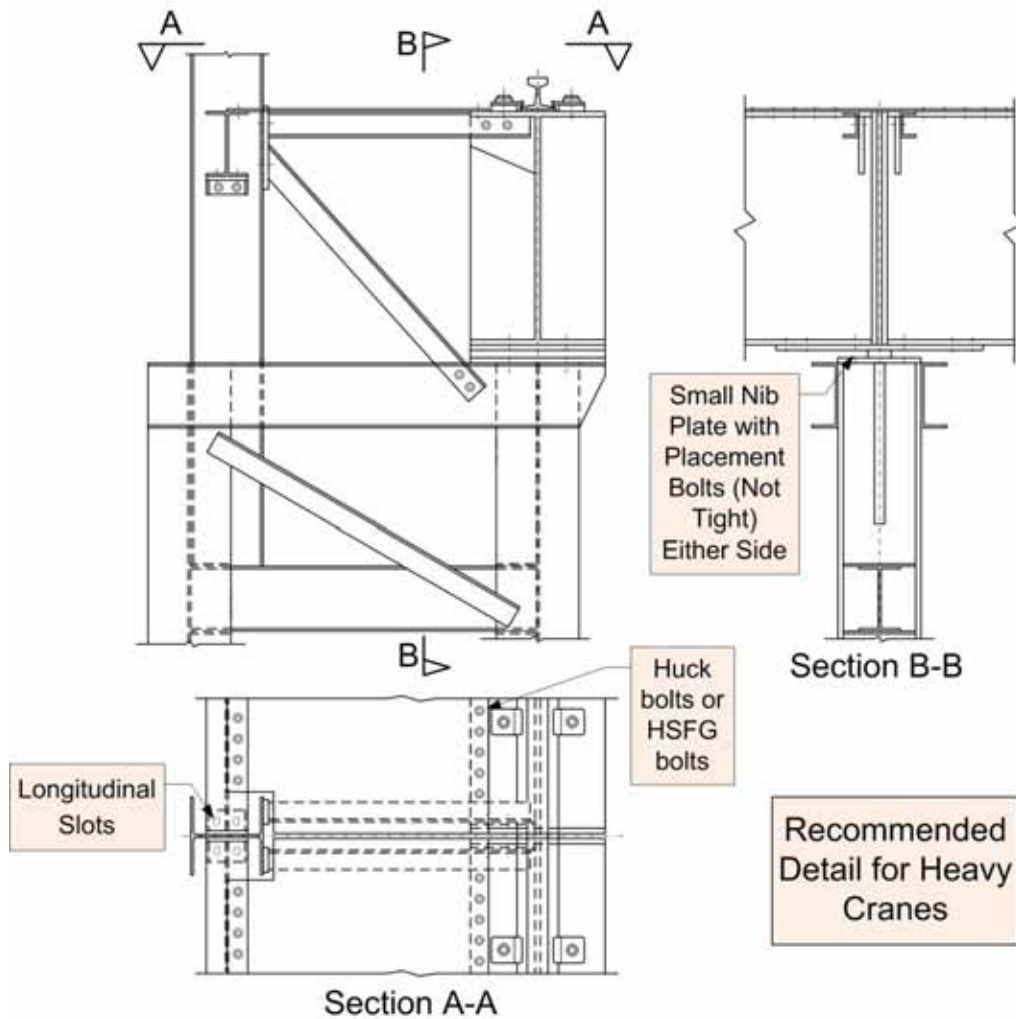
A heavy support structure detail making use of a surge plate resting on a bracket.
